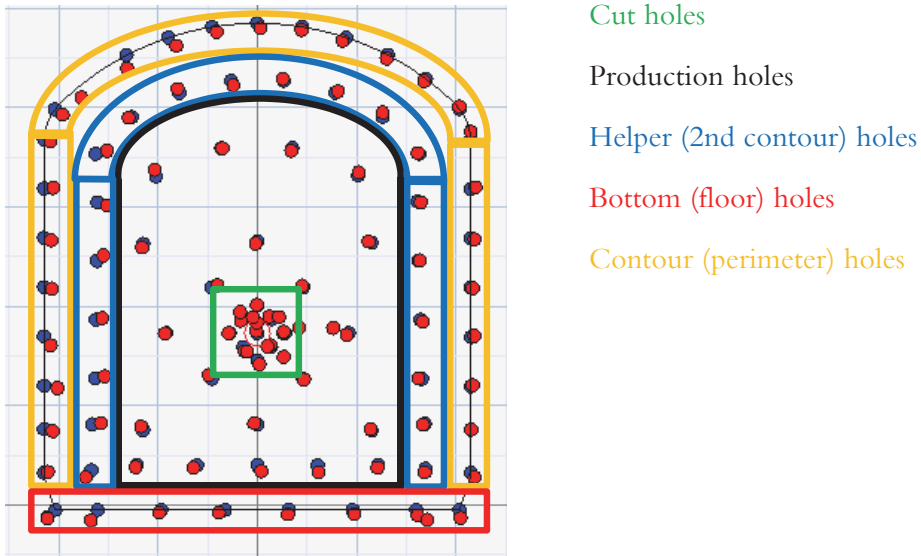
Schematic layout of a blast hole drilling round for a tunnel blast. The blue dots show the drill plan and the red dots the drilling performance.
